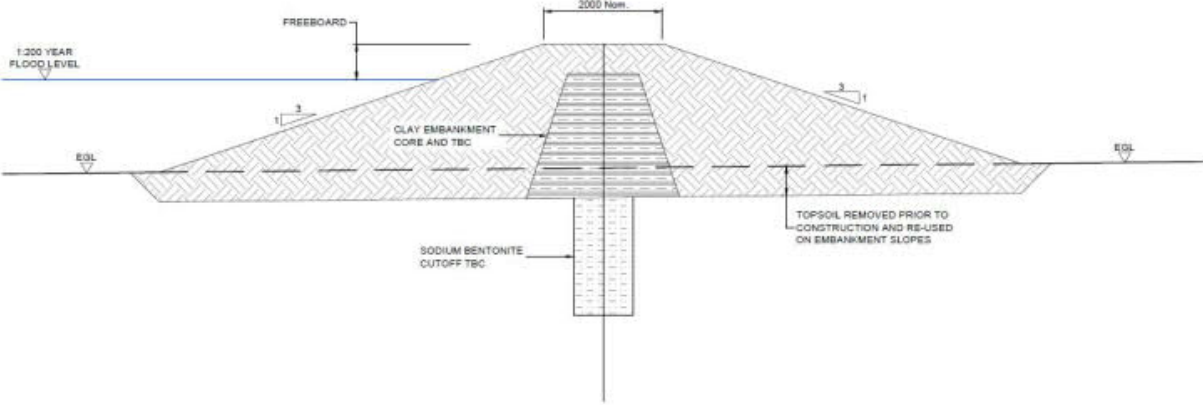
TYPICAL EMBANKMENT CONSTRUCTION CROSS SECTION
